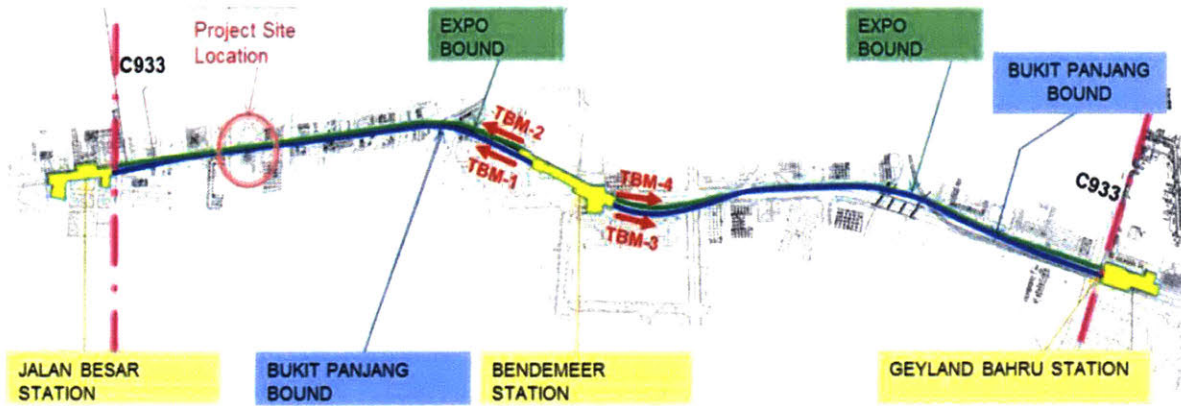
Site plan contract C933 DTL3 showing location of tunnel monitoring sections (Su, 2015)
